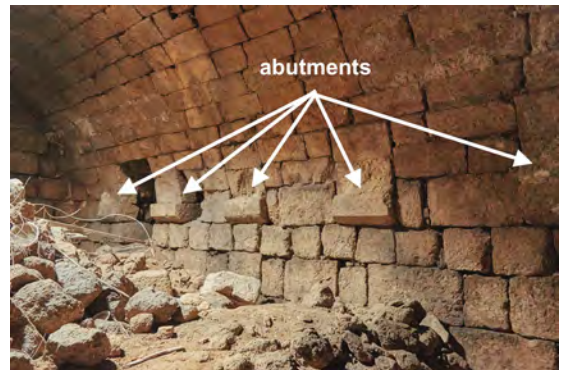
South wall of cistern (Source: BAI/GPIA).
